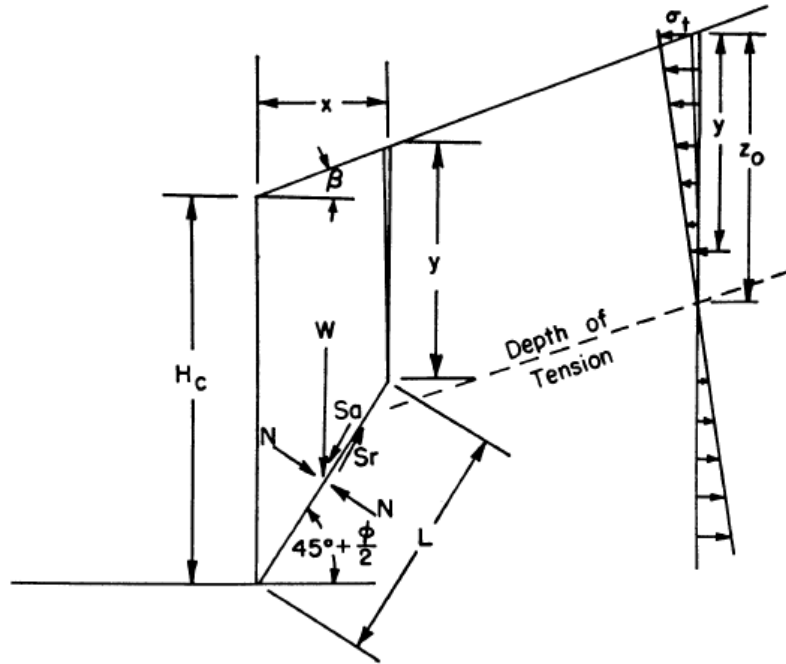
Rankine earth pressure theory indicates tension leading to vertical cracking in upper soil adjacent to a cut, and if the cut is high enough, slab failure. After Lohnes (1968).
